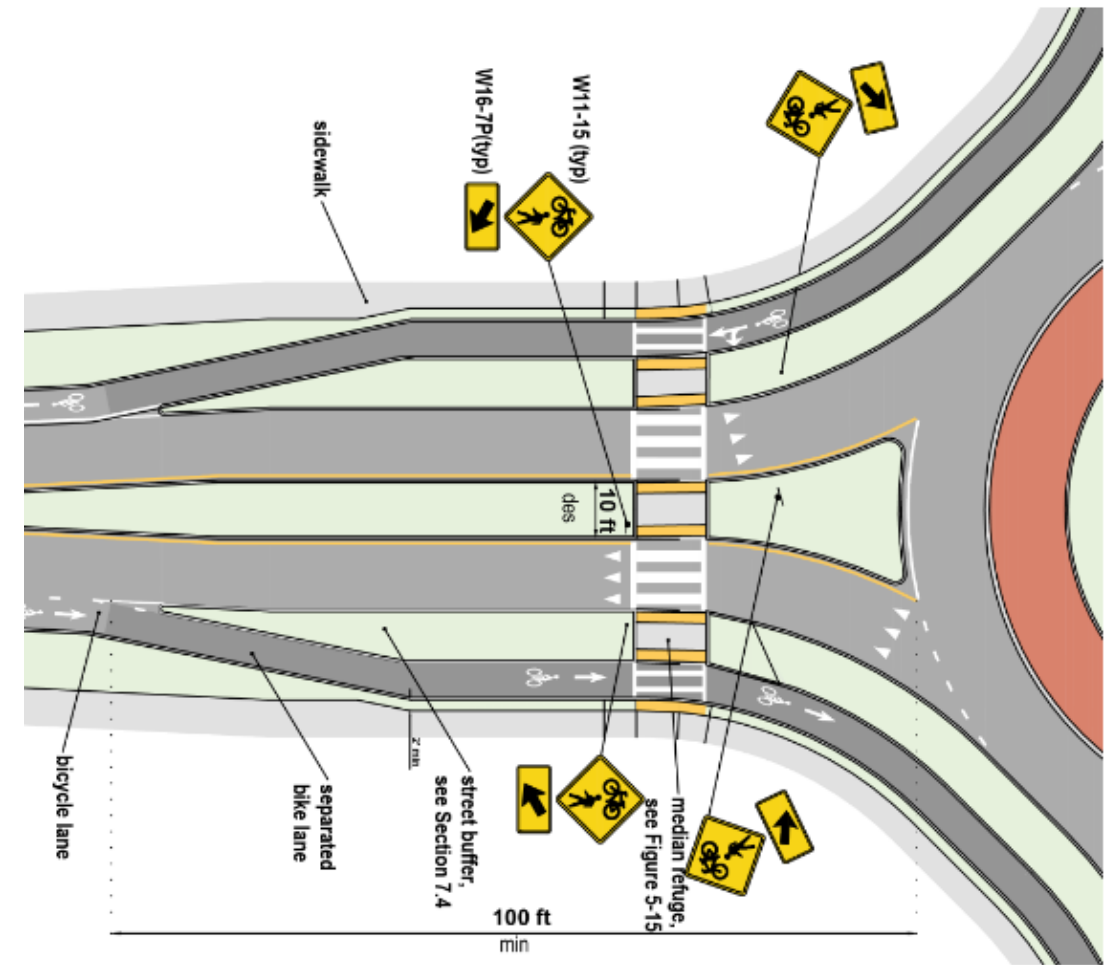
Typical Layout of Separated Bike Lanes at Roundabout
